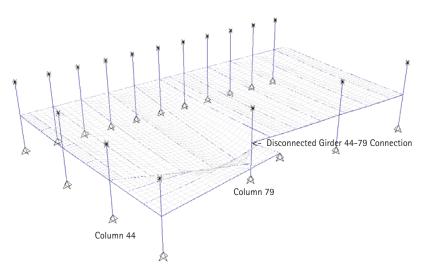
Deformed SAP2000 model under gravity loads with disconnected girder (4x amplified elastic deformation)
